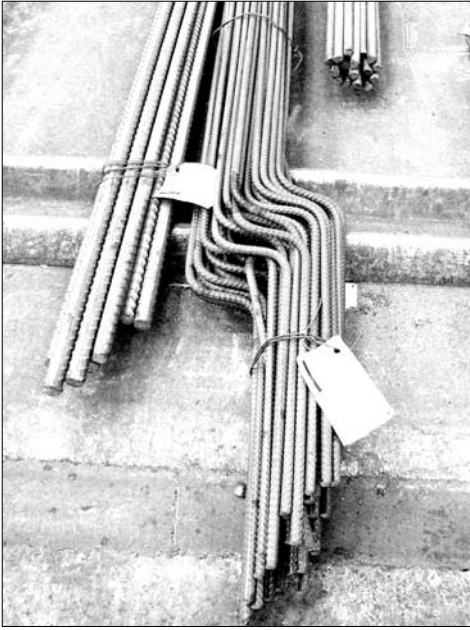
Reinforcement cut, bent and bundled for delivery to site
